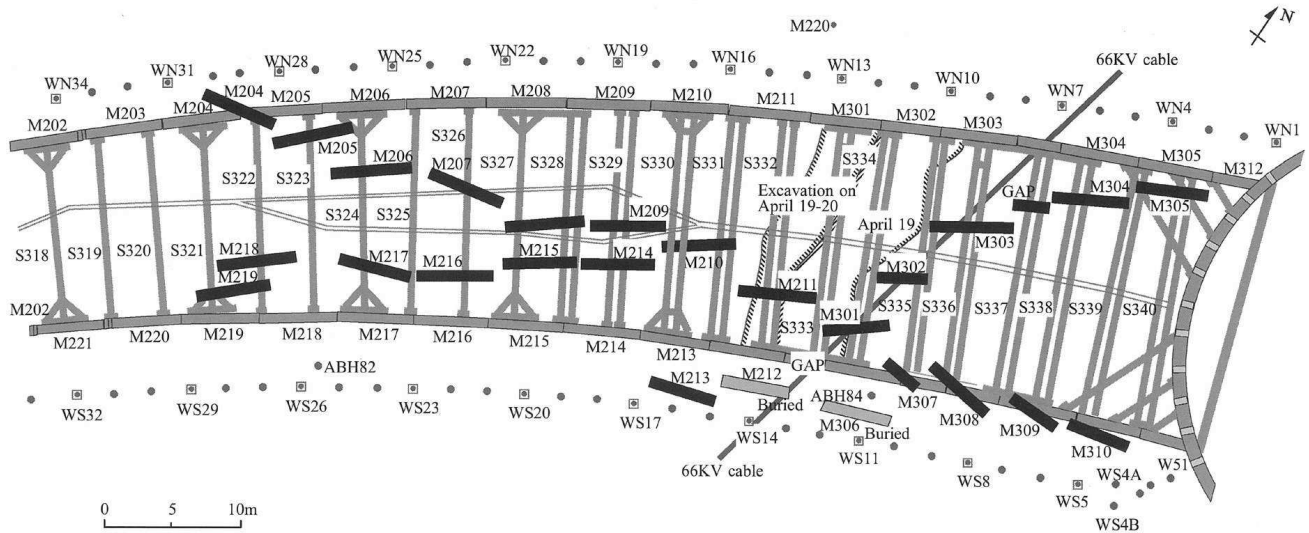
Detailed arrangements of the struts, diaphragm wall panels and locations of the magnetic logging.
